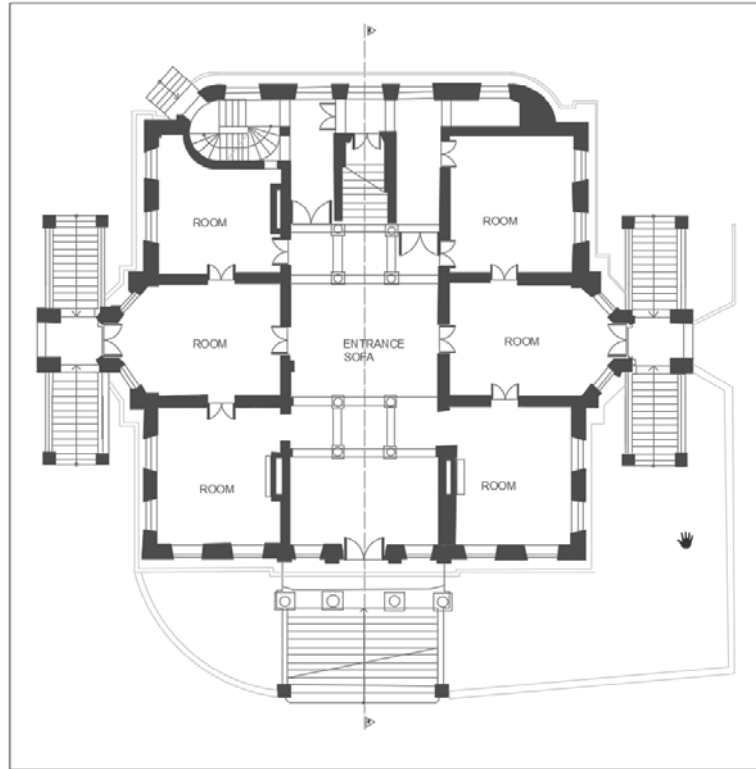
Ground floor plan of the kiosk. (Source : Altınkaynak 2006)
